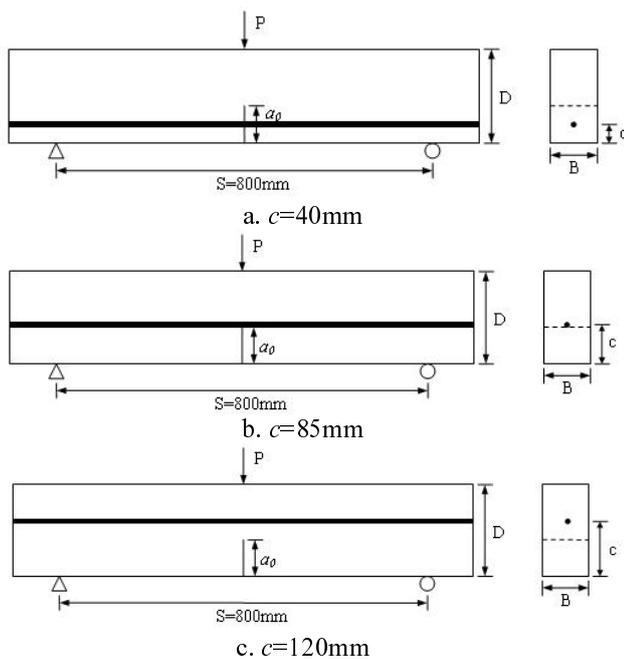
Arrangement of reinforcing bar in concrete three-point bending beam.
